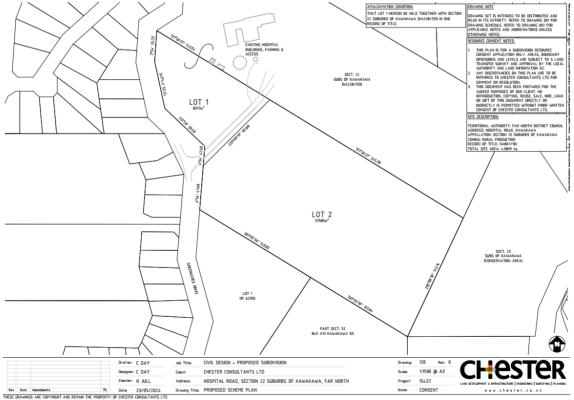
Subdivision Scheme Plan (Chester Drawing 15437 - 120)
